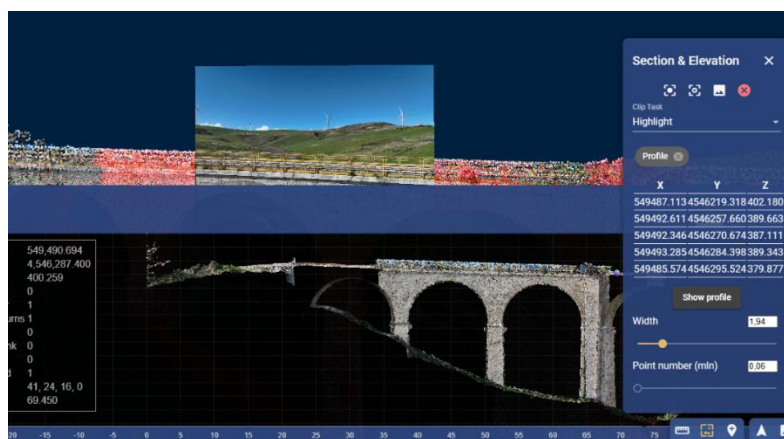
Section of part of the bridge reconstructed with point cloud.
